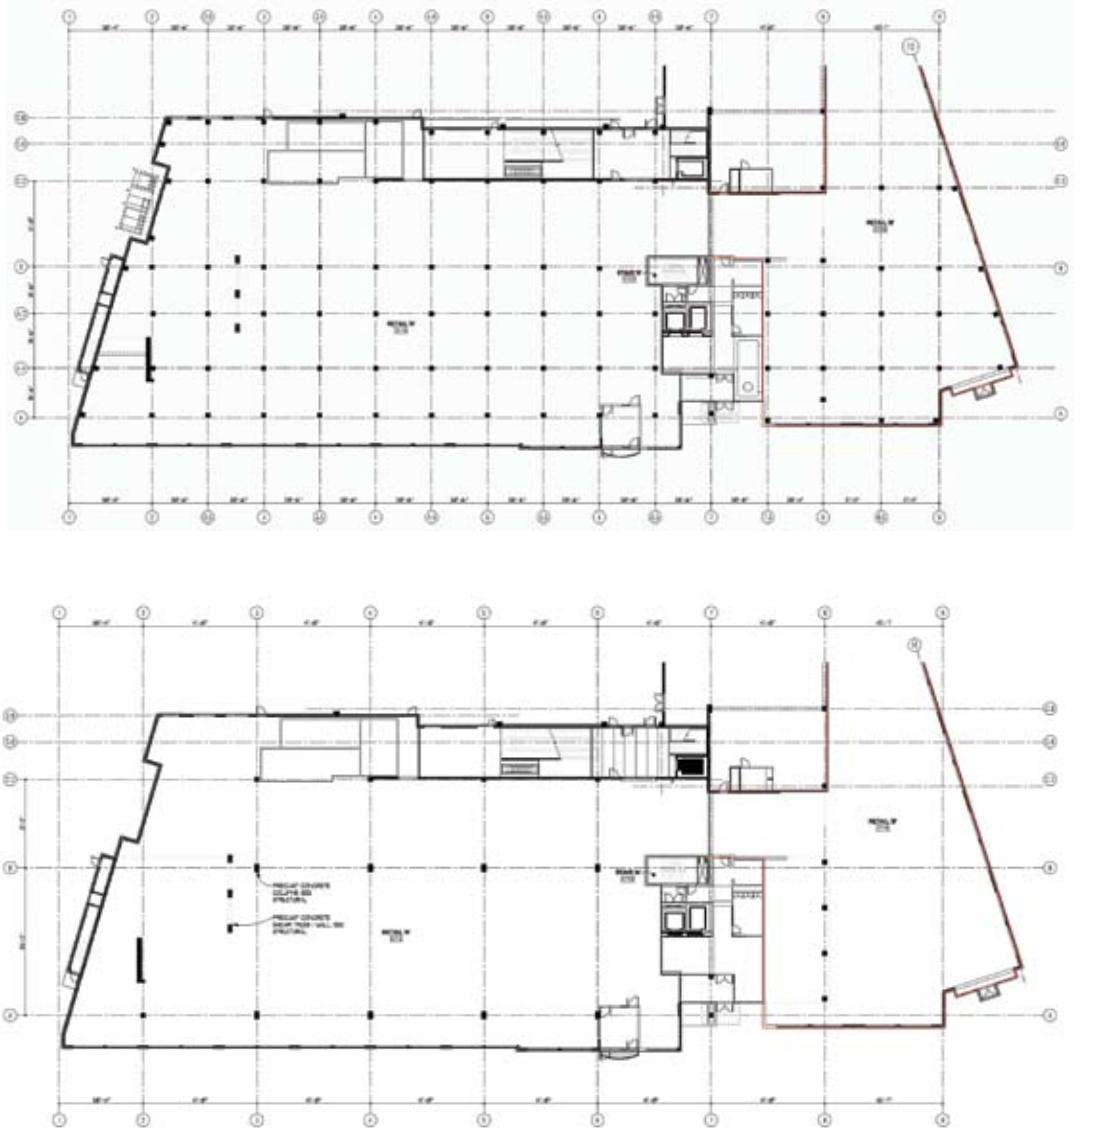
Reduction in building materials and resource conservation are evident in the comparison of these two building plan views depicting the column placement in a conventionally built concrete structure and the remarkable reduction in columns and increased open space in the same structure built with the new ER-OST system.
